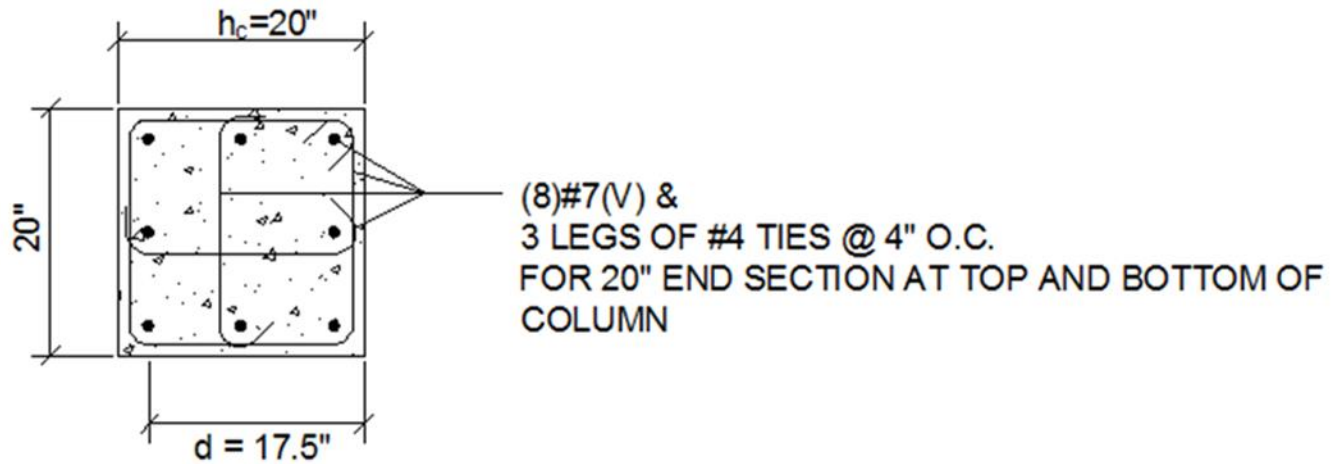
Interior column, cross-section end of column at all floor levels based on SDC D design.
